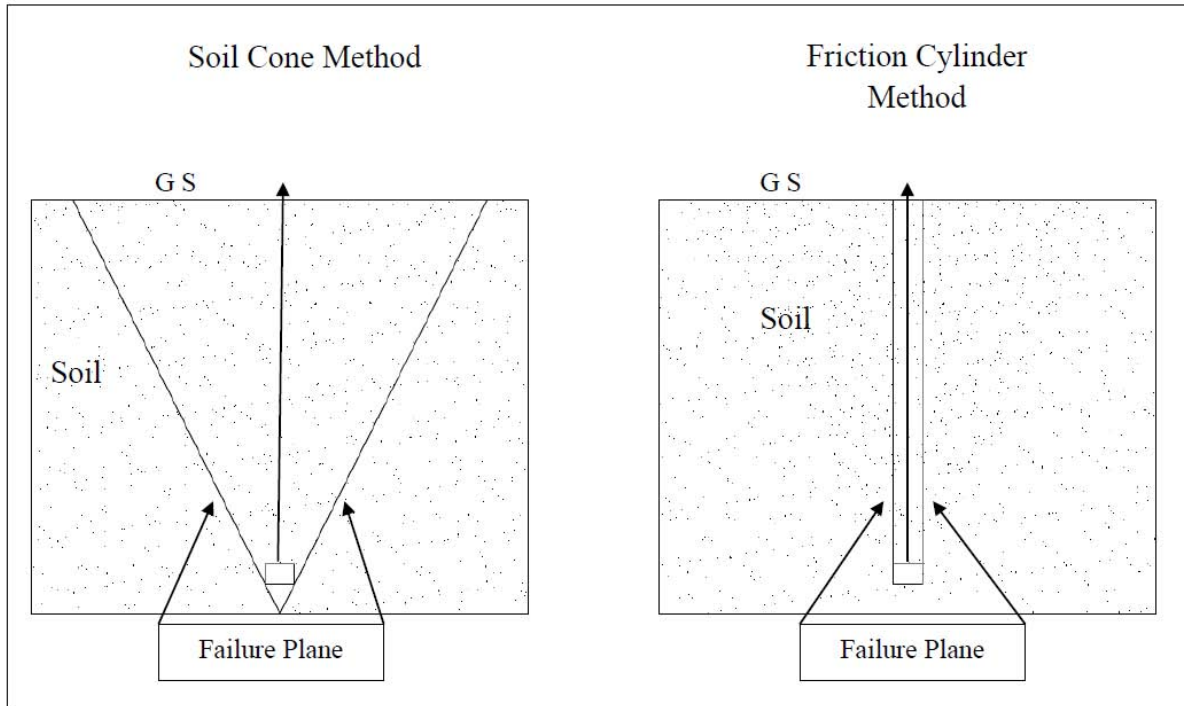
Assumed Soil Failure Planes for Soil Cone and Friction Cylinder Method⁽¹⁶⁾
